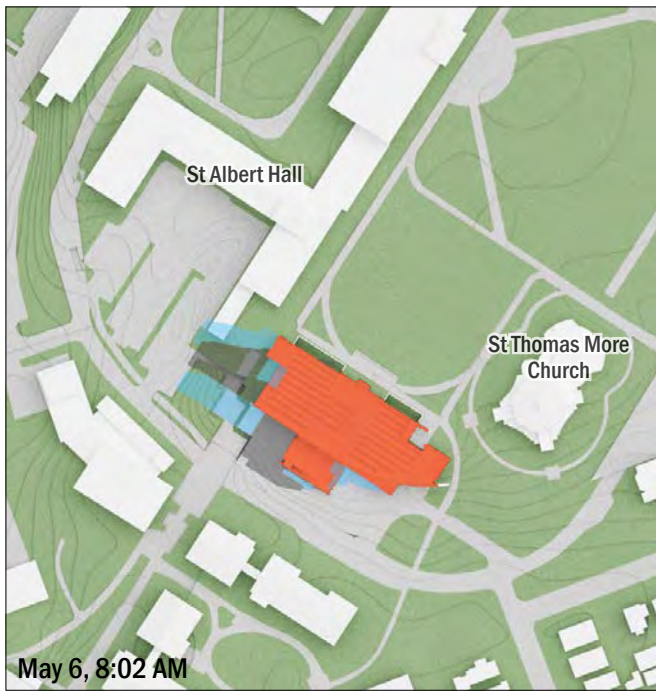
Shadow Assessment Tier 3 | Proposed Building
